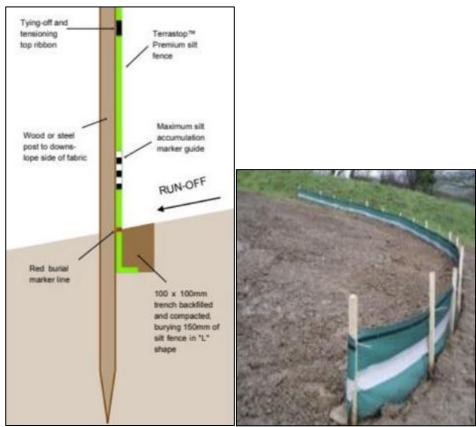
Example of Hy-Tex TerrastopTM Premium silt trap installation.
